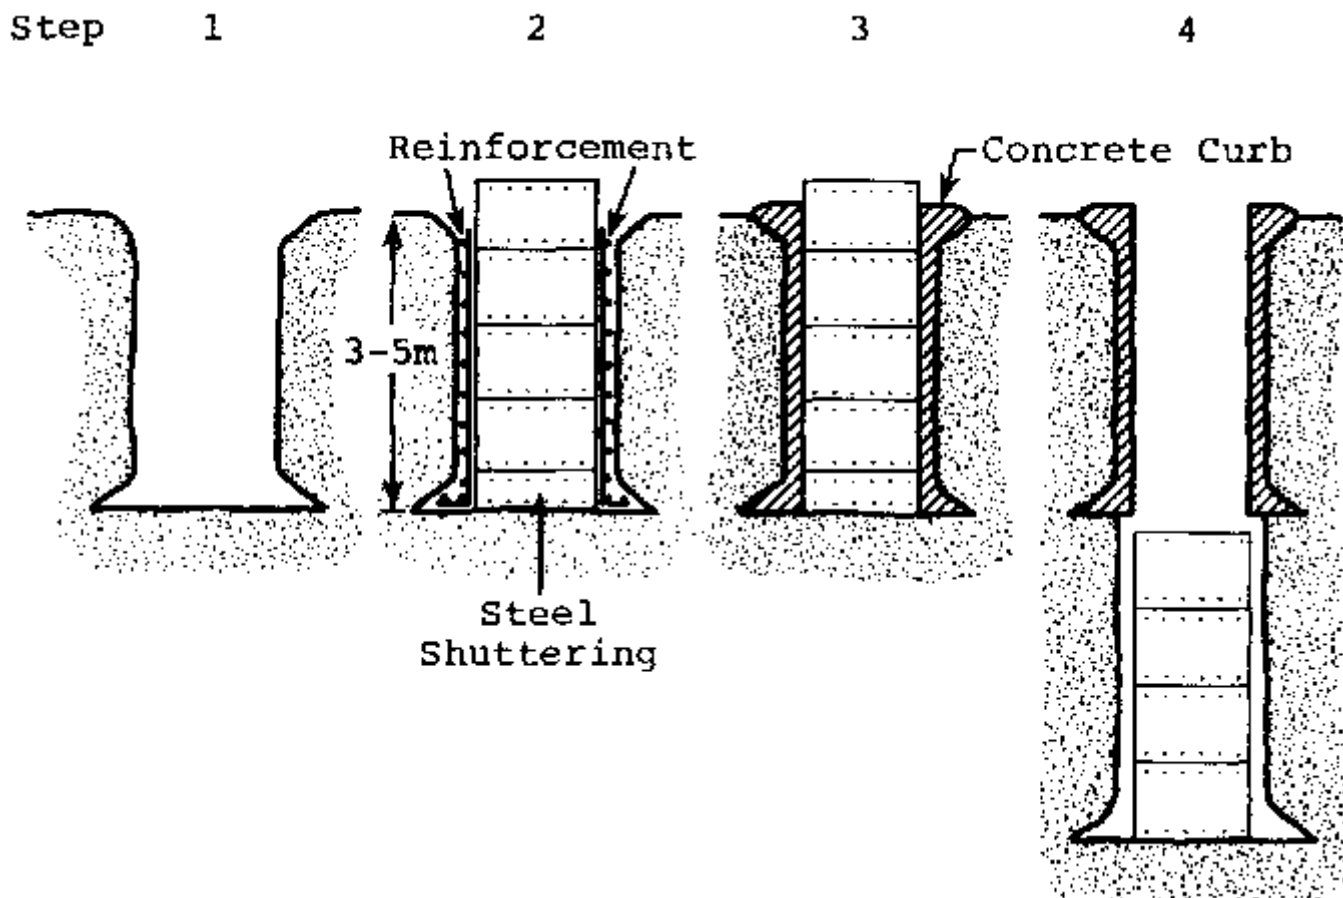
Steps For Constructing Reinforced Concrete Well Shaft
